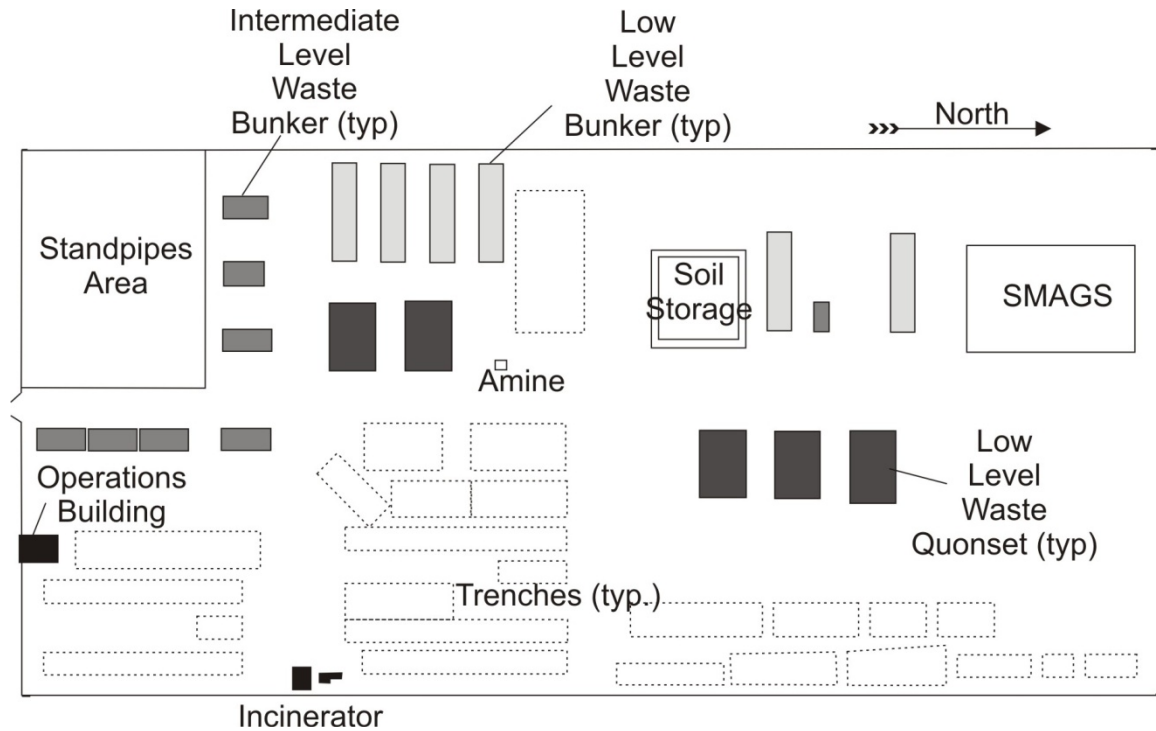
Layout of the WL WMA Indicating Waste Storage Structures
